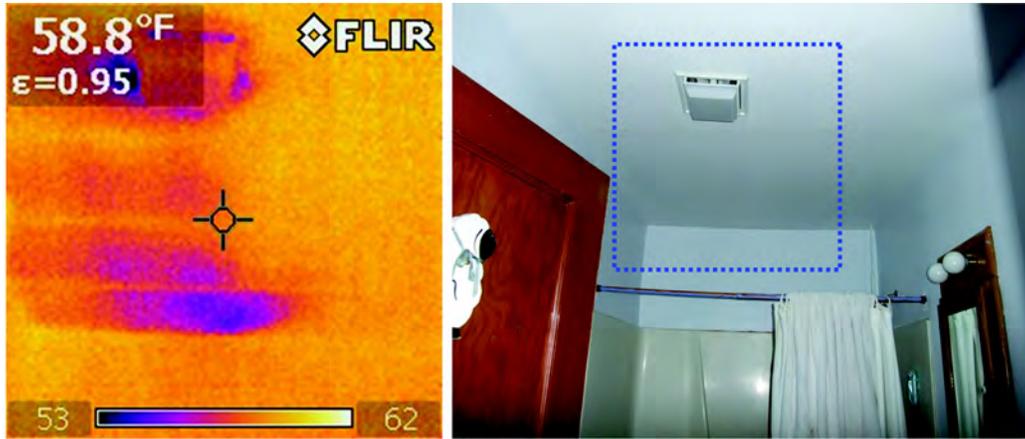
Air infiltration visible at bathroom exhaust fan; exterior wall beyond shower. Infrared image shows strapping/furring at ceiling, perpendicular to joists, supporting lath and plaster.
